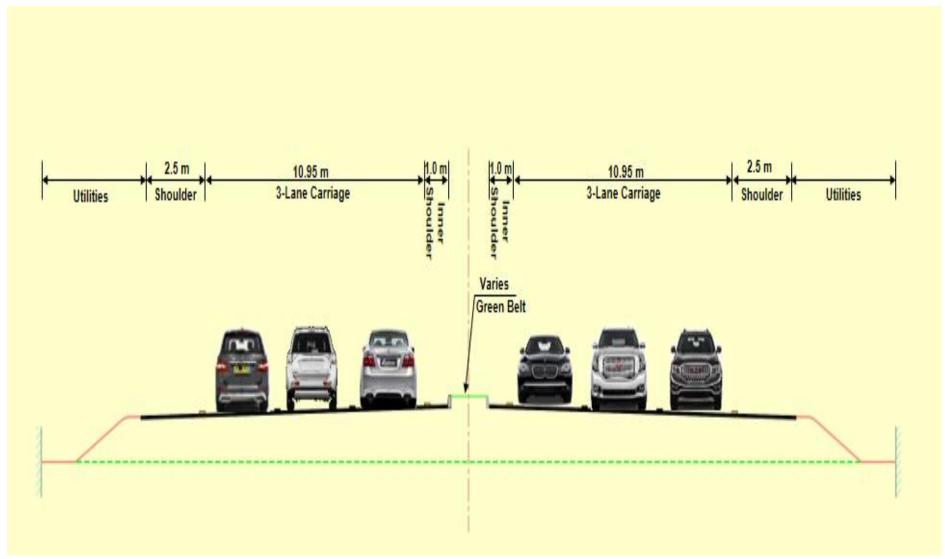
Typical Cross Section of the 3 Lane Road without Service Road
